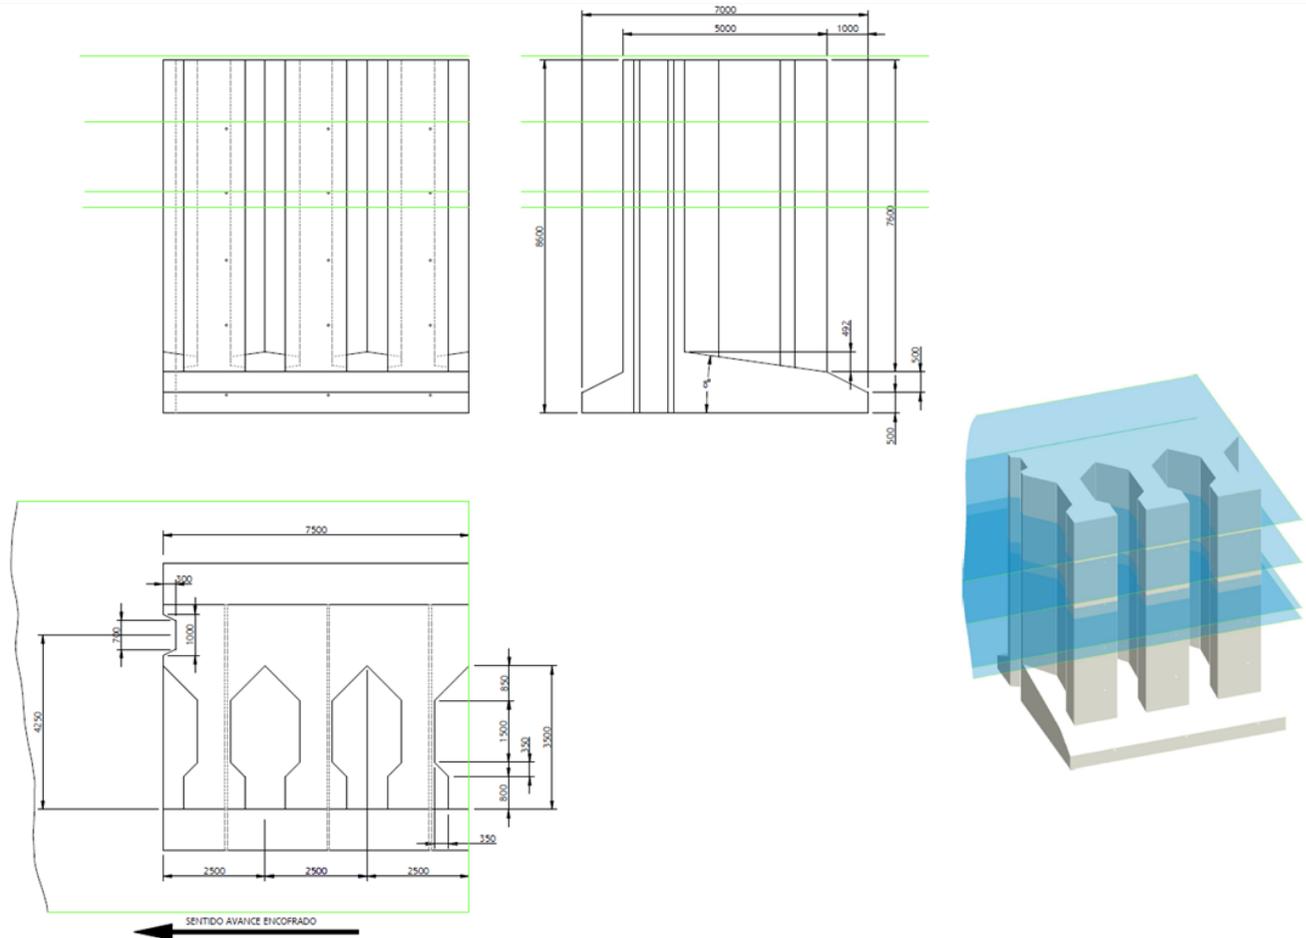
Section to be executed with Rubrica's Formwork. Detail of the internal slot openings for waves dissipation
